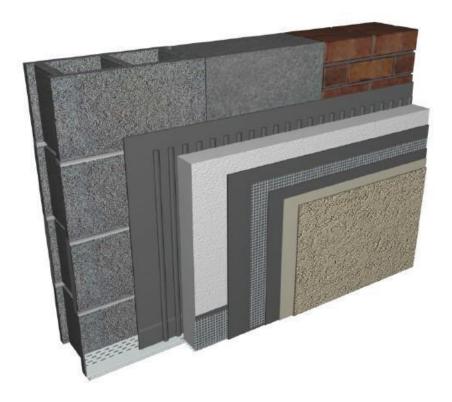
"InsulROCK EIFS" with moisture barrier over masonry, concrete, and brick
